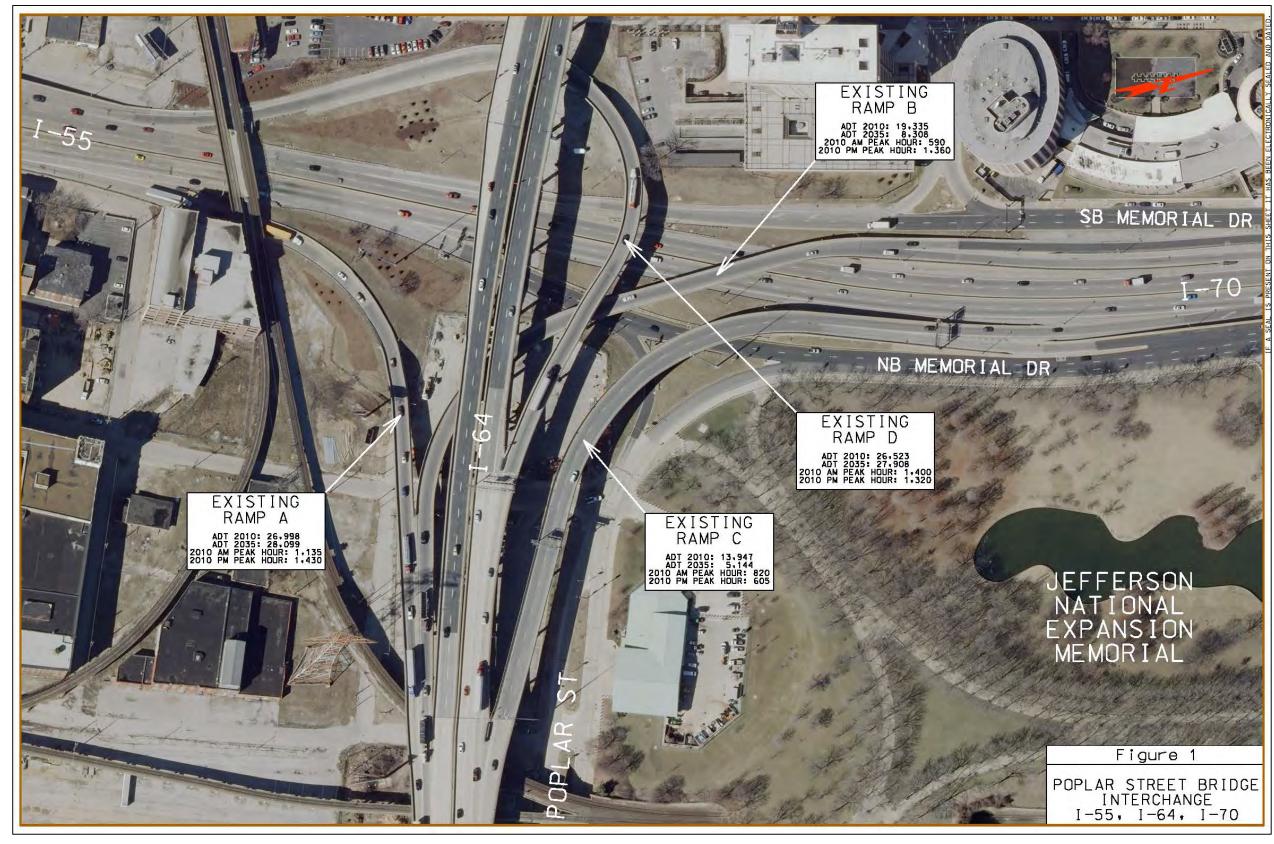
Existing Poplar Street Bridge Interchange
